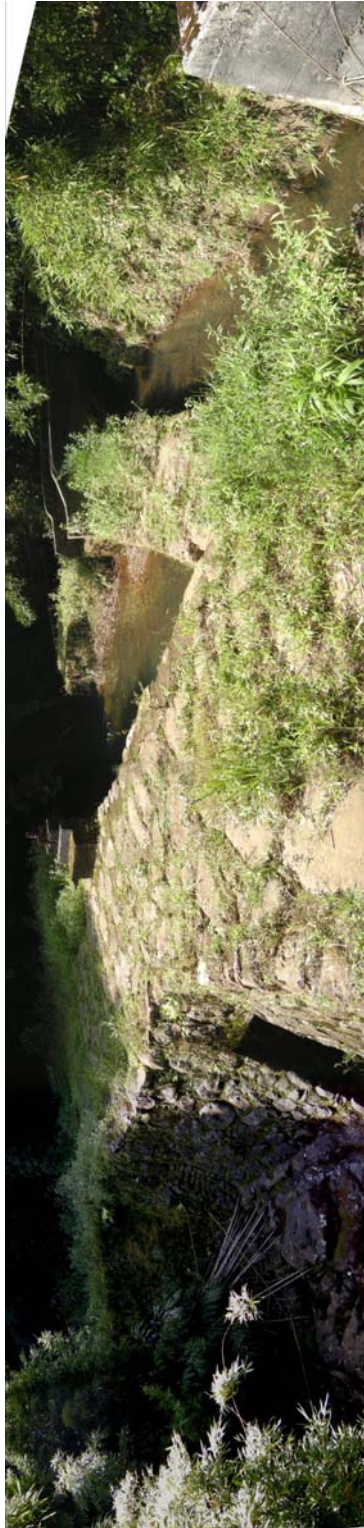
HI\_ Maui County\_Kolea Reservoir\_7. Detail view of the visible portion of the outlet works at the downstream toe of the dam. View facing southeast.
